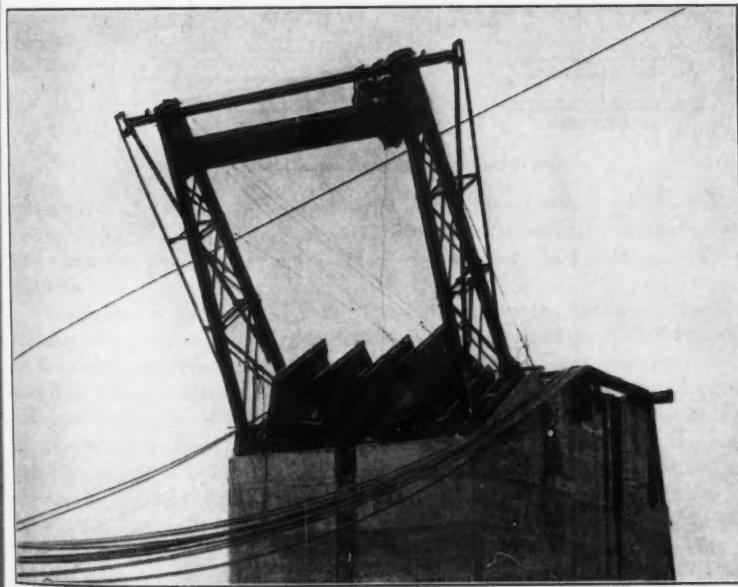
ANCHORAGE CABLE SADDLES, NEW YORK.
